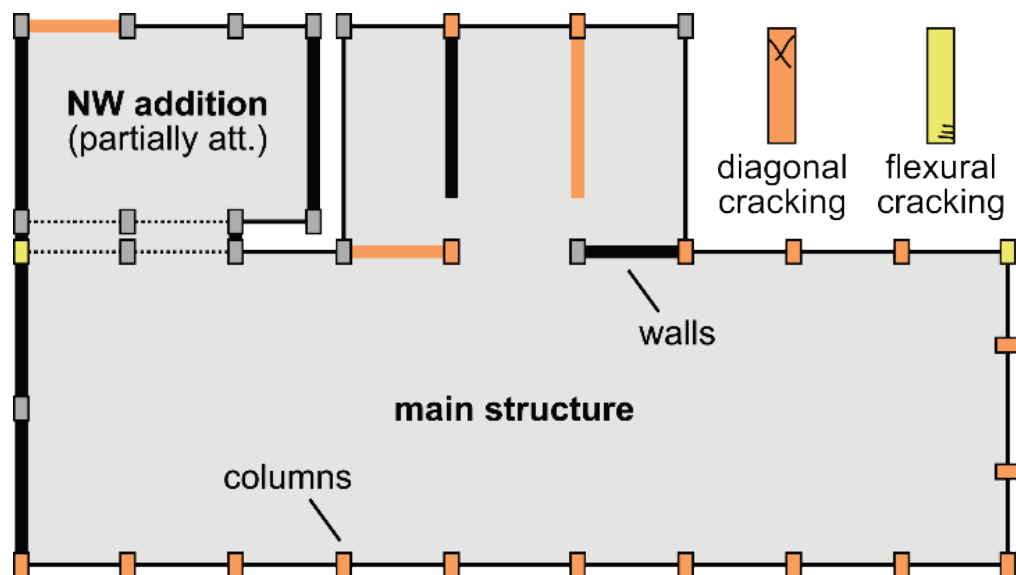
Illustration of column and full-height masonry wall damage at first story. (Damage was not observed in the walls colored black).
